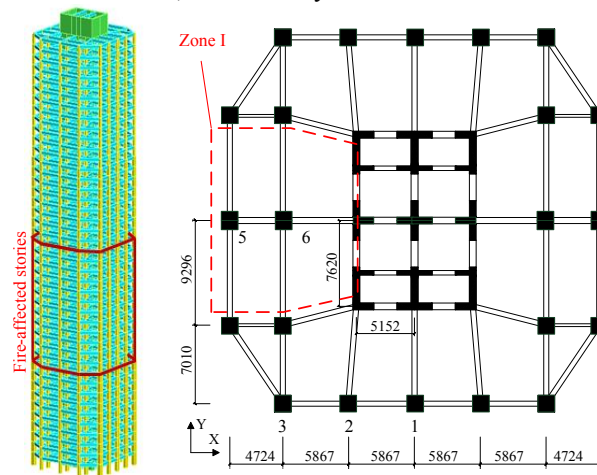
Structural arrangement and position of the fire-affected area (Unit: mm)
